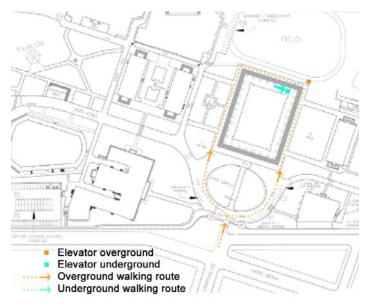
Overground walking route to the elevator box is in orange. Underground route for the elevator in basement is in blue.
